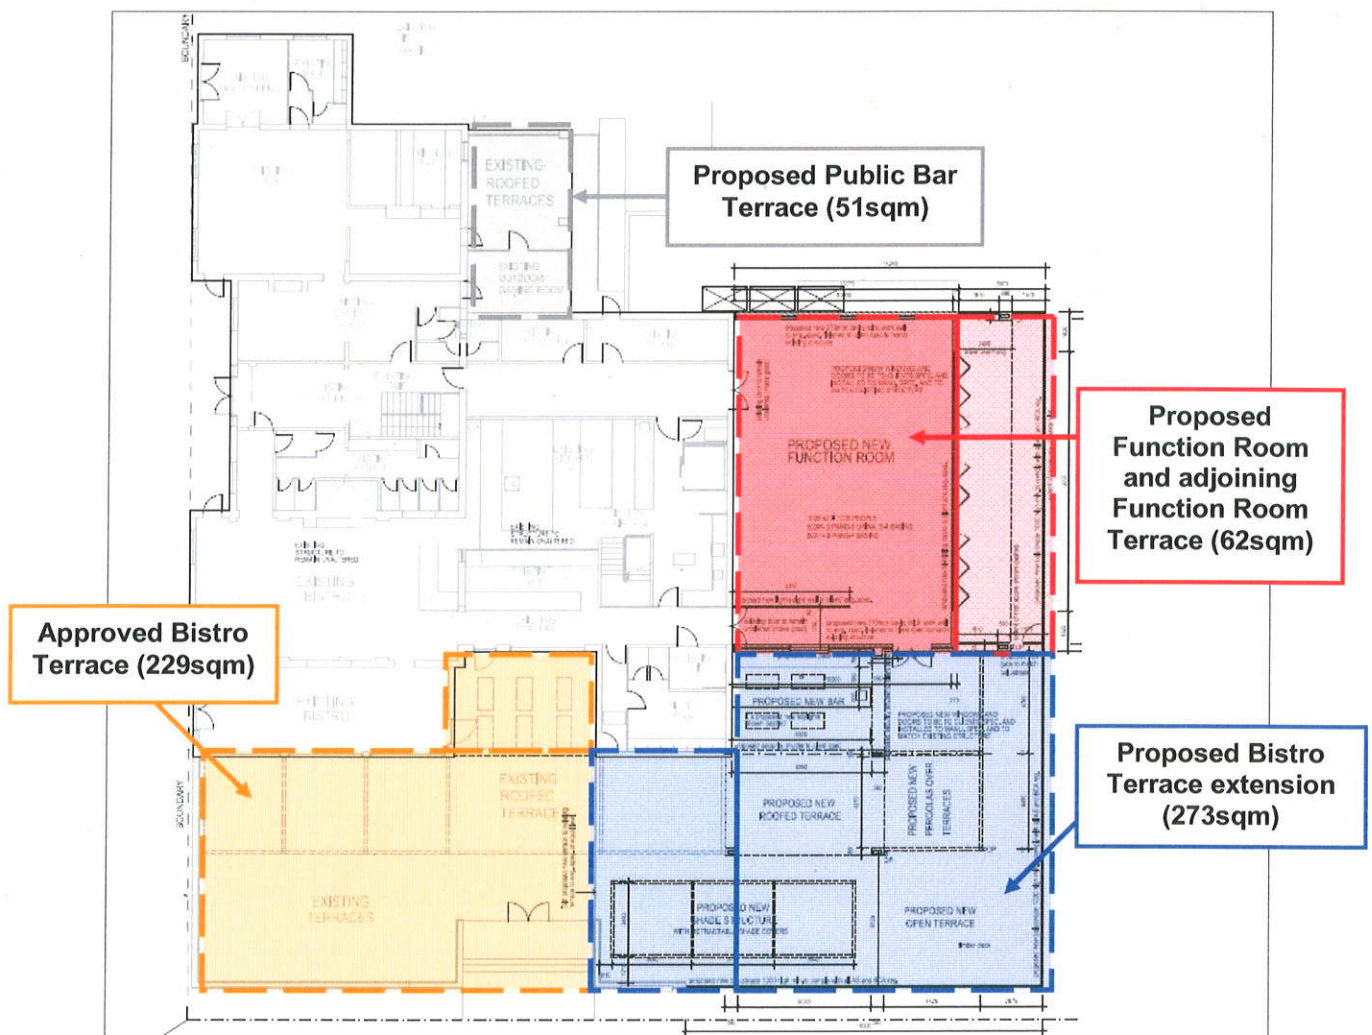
Illustrated plan of proposed MOD2 modifications to the ground floor, illustrating the function room and the proposed mix of outdoor dining / drinking spaces
